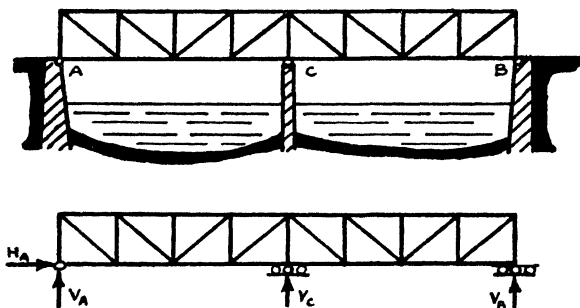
BRIDGE GIRDER WITH REDUNDANT REACTION
